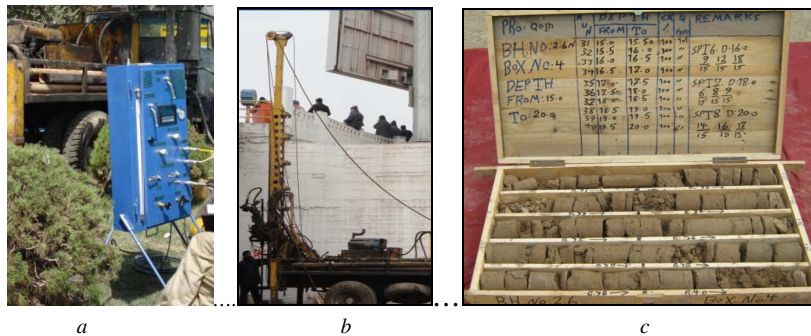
(a) PMT device, (b) drilling machine and SPT device and (c) samples taken from borehole drilling.
